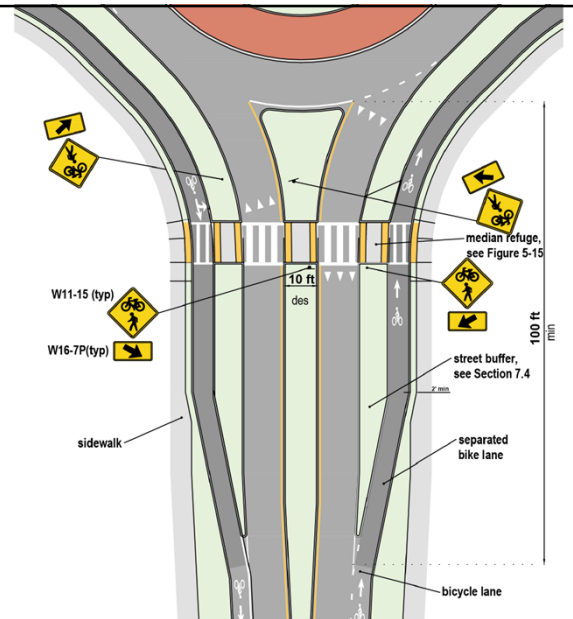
Typical Layout of Separated Bike Lanes at Roundabout
